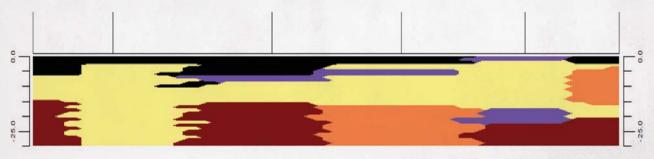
Section 3 (BH 35 - BH 37 - BH 24 - BH 23 - BH 22 - BH 21)
